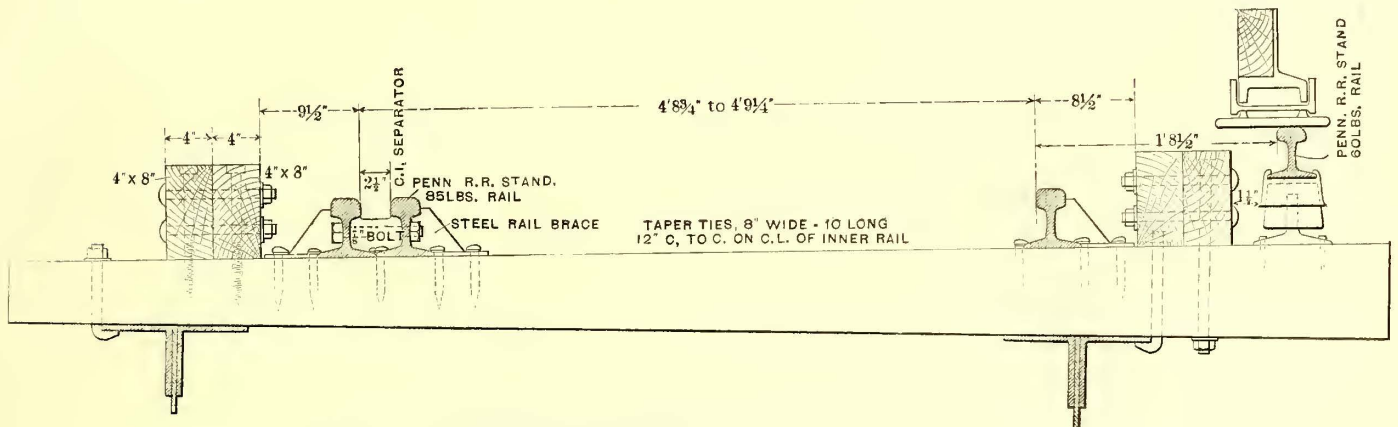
SECTION OF TRACK ON TANGENT—BROOKLYN ELEVATED RAILROAD
